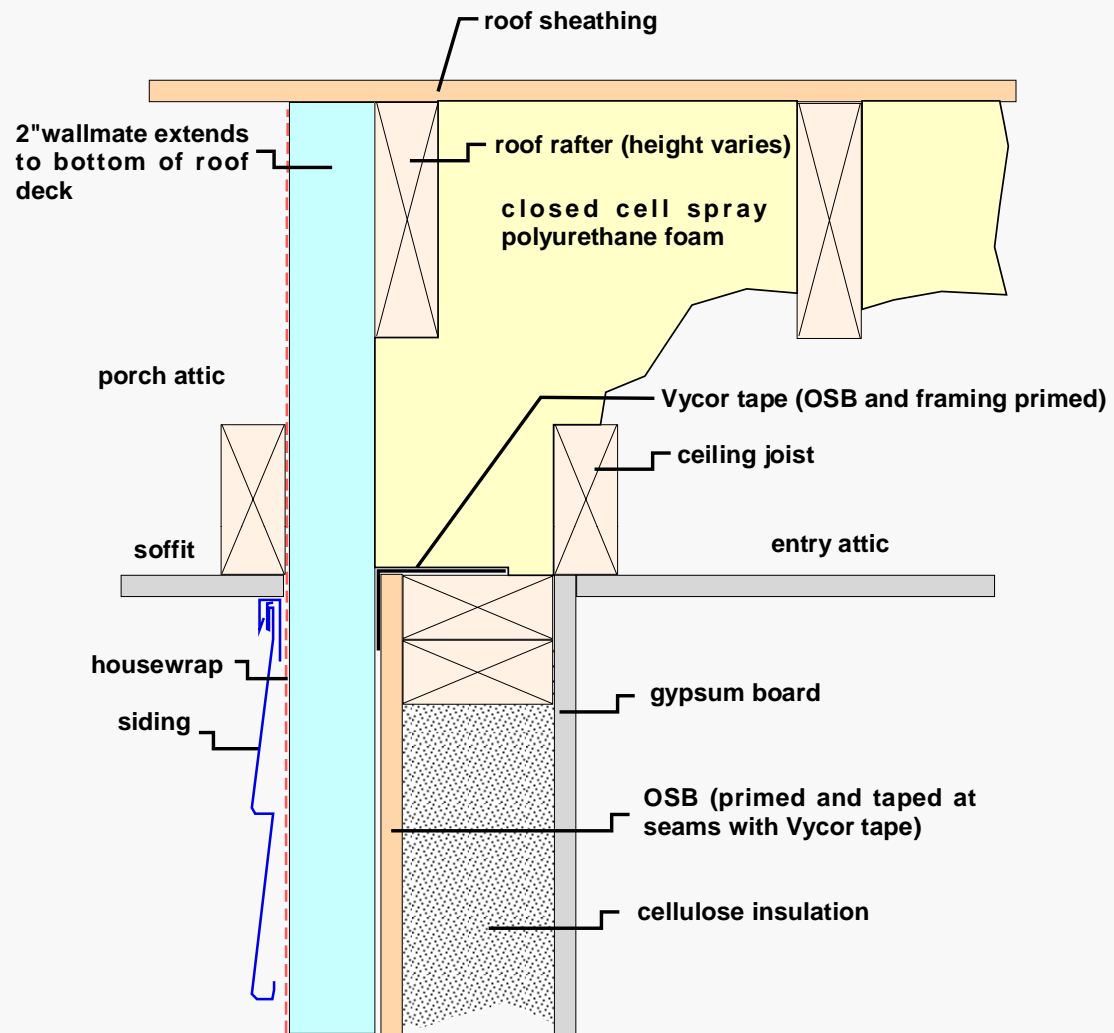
Detail of entryway exterior wall, attic space and entryway roof.
